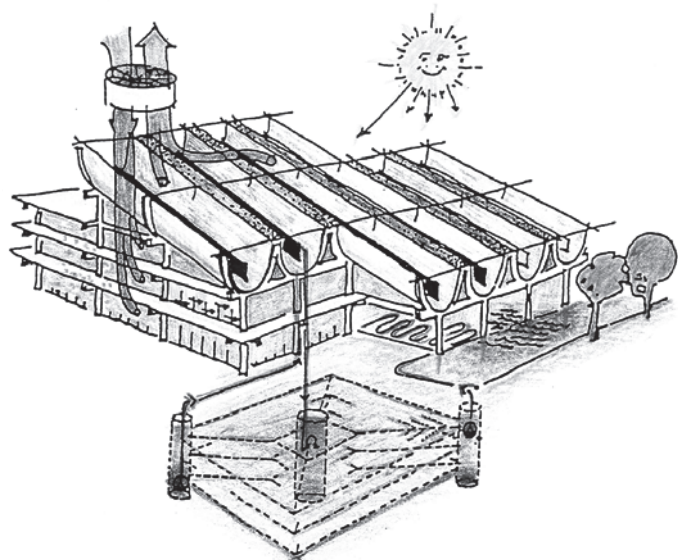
Parabolic roof shells as designed for the Lelystad town hall (to be discussed in chapter 09)
